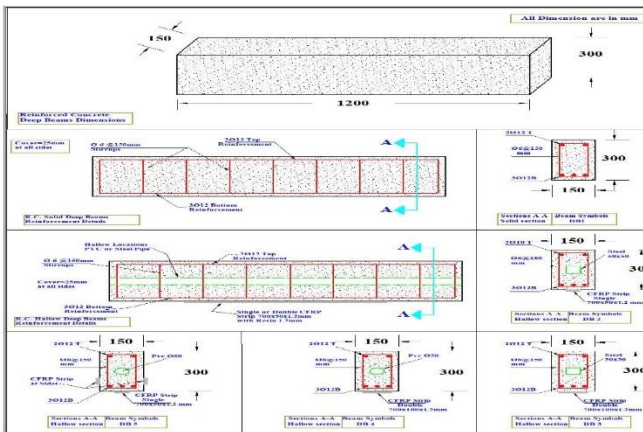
Details of Reinforced Concrete Deep Beams [18].
